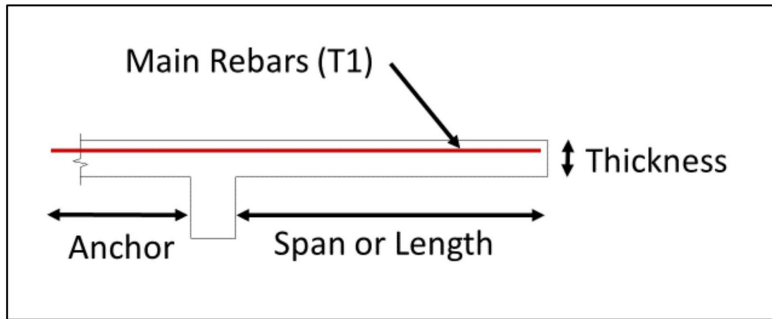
CANTILEVER SLAB (ONLY MAIN REBARS SHOWN)
